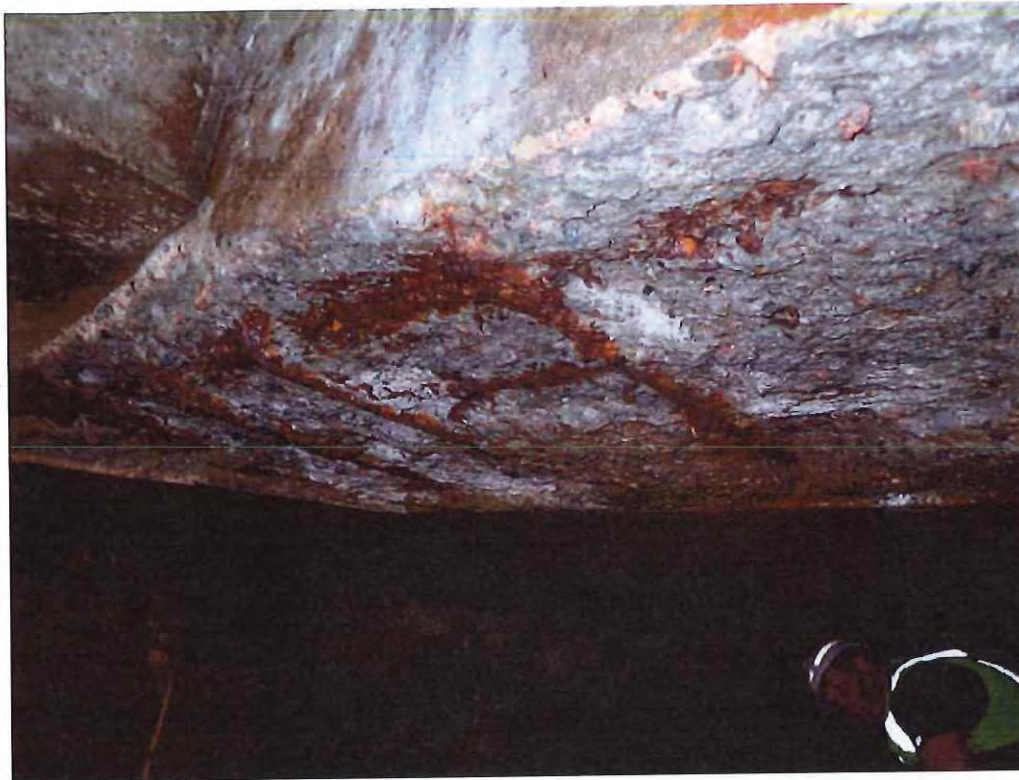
Interior west sidewalk beam: spall measuring full length x full width x up to 3" deep with exposed rebar and 100% section loss to the stirrups
